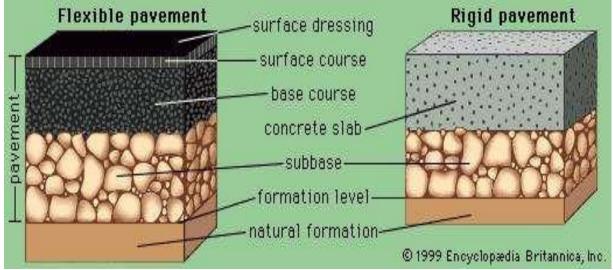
Cross sections of modern pavements (Left) Flexible asphalt-based pavement. (Right) Rigid Portland-cement concrete
